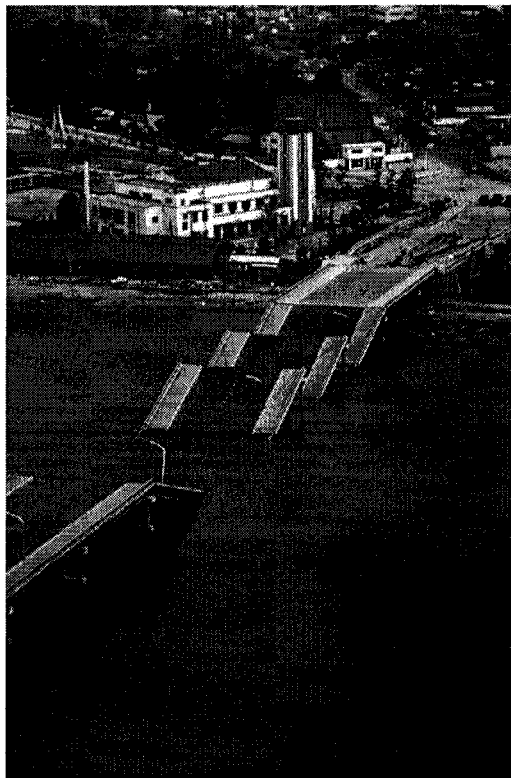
Showa Bridge, Japan (Steinbrugge Collection).
